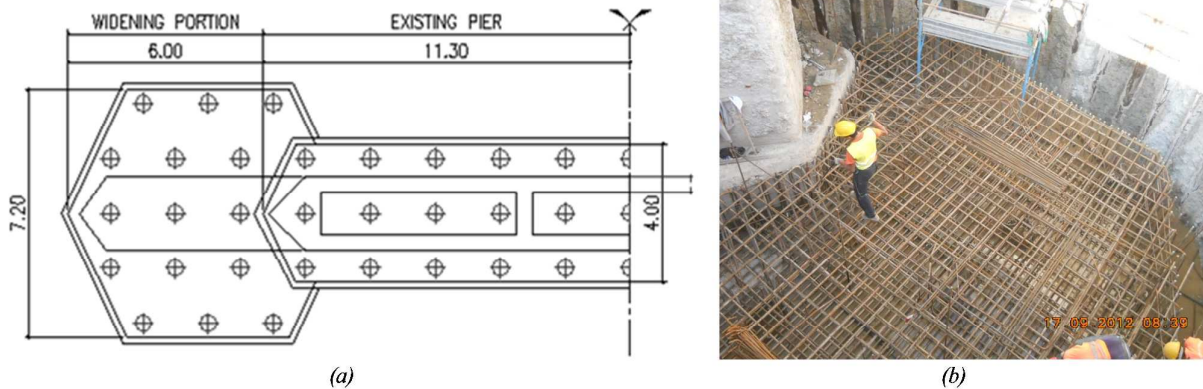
Widening and retrofitting interventions of foundation. (a) Plan view of new and existing foundations. (b) Positioning of steel reinforcement of the widening portion of the plynth.
